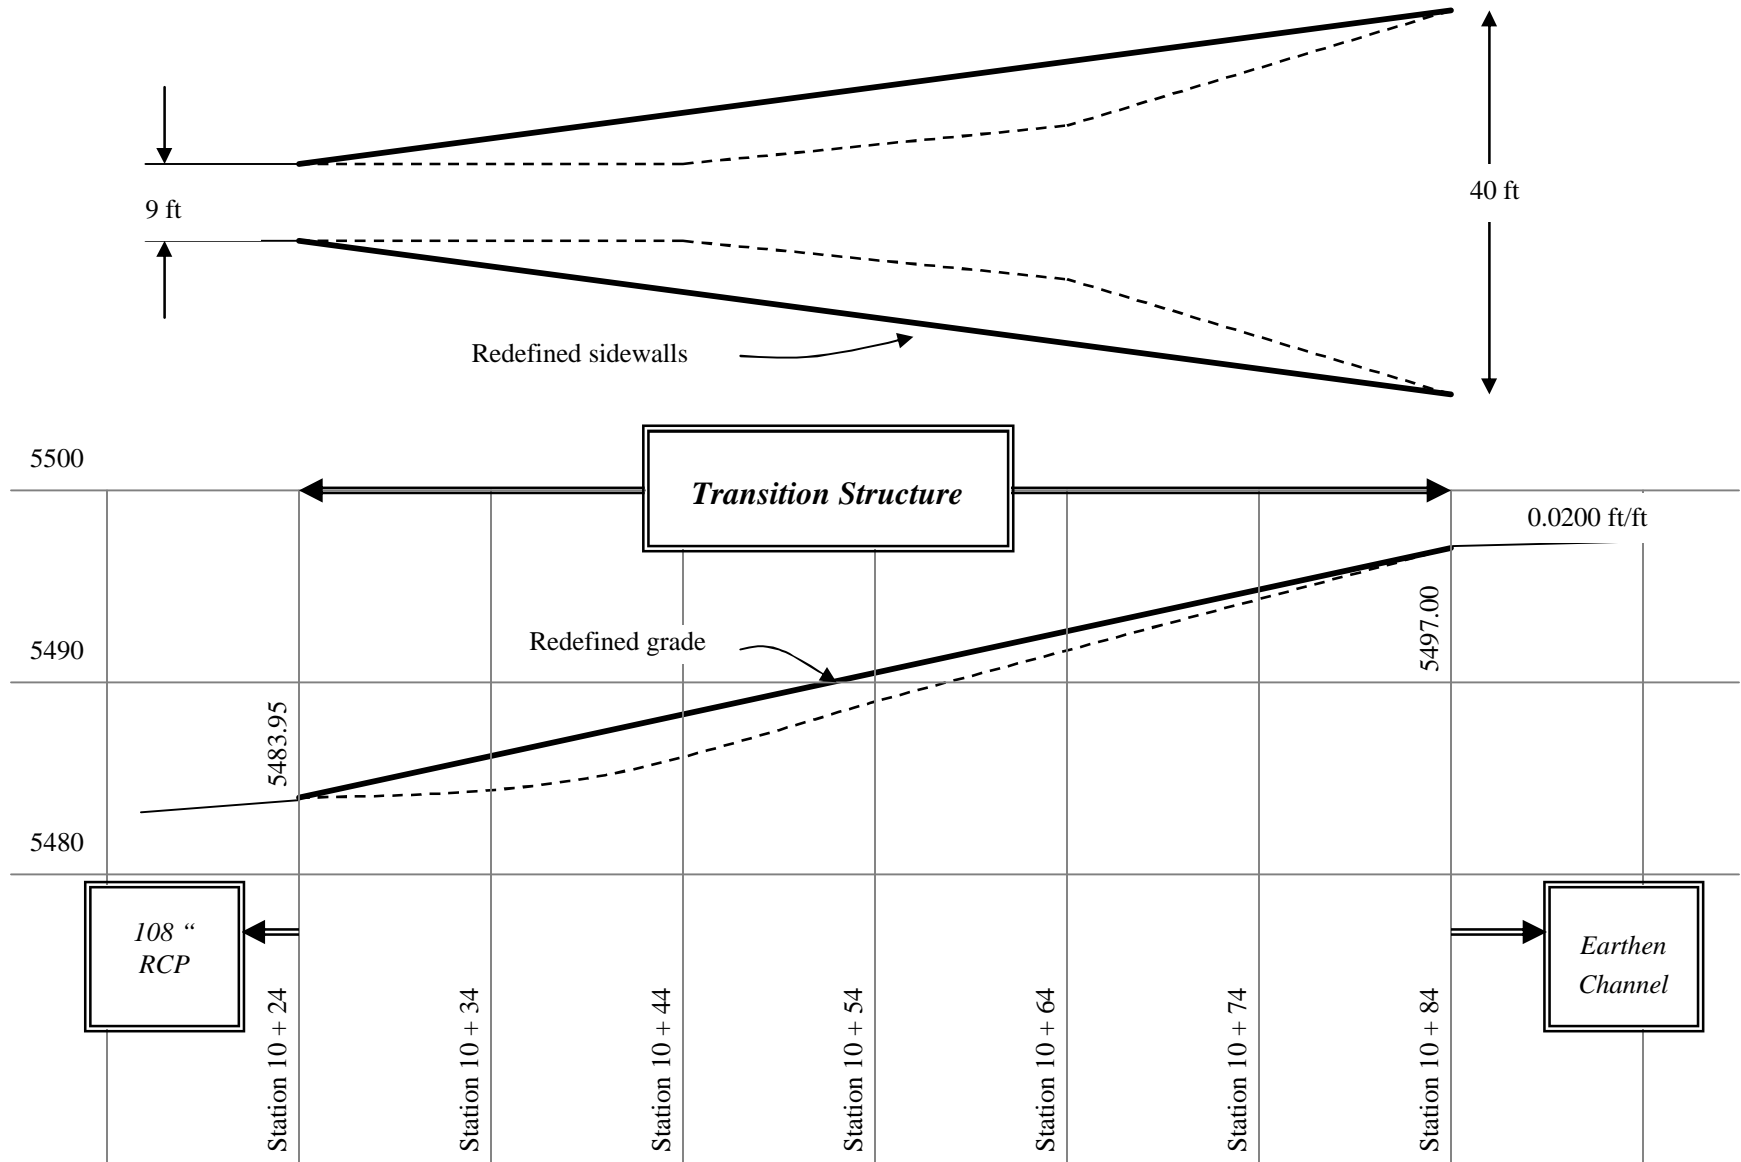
Plan and Profile of Transition Structure (Original Design and Redefined)
